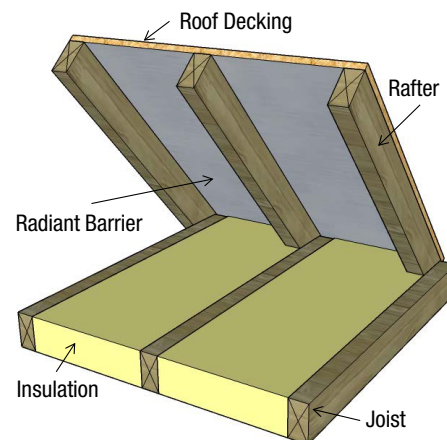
Skipped sheathing removed, solid roof decking with radiant barrier laminated to the underside installed over rafters.
